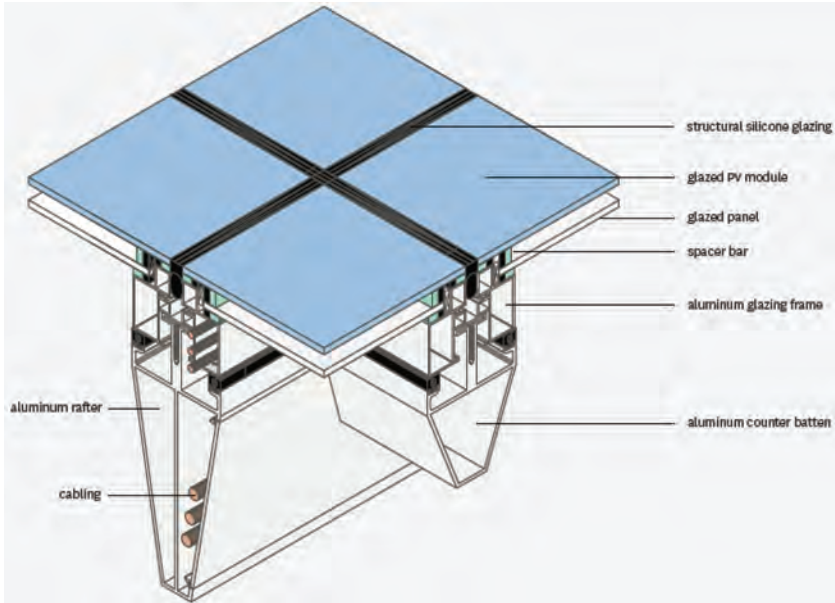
Detail of a horizontal overhead glazing system with PV modules. (From Roberts, S., and Guariento, N., *Building Integrated Photovoltaics: A Handbook*, Walter de Gruyter GmbH, 2009.)
